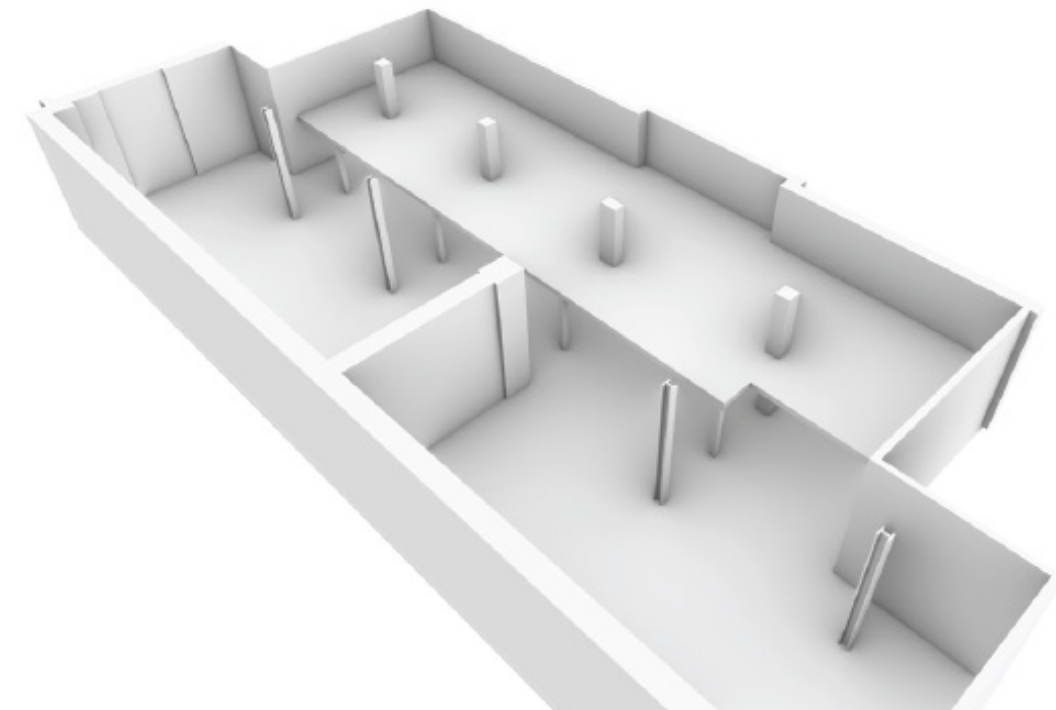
Axonometric image showing proposed mezzanine in relation to existing structure
